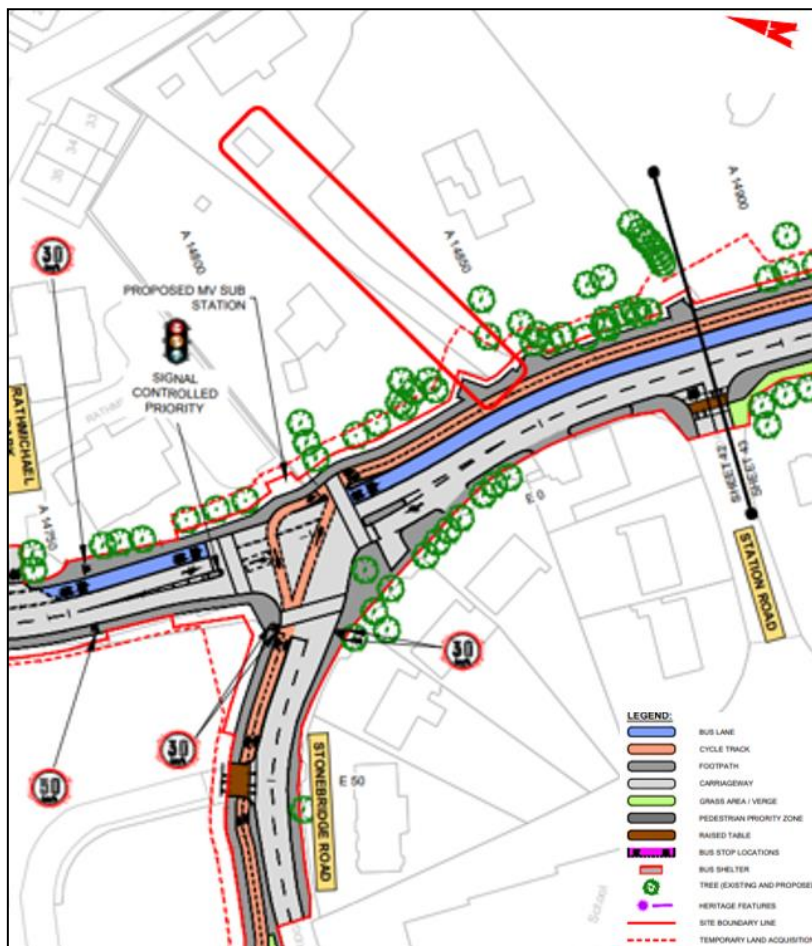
Extract from General Arrangement Drawing at Dublin Road (Sheet 42)
